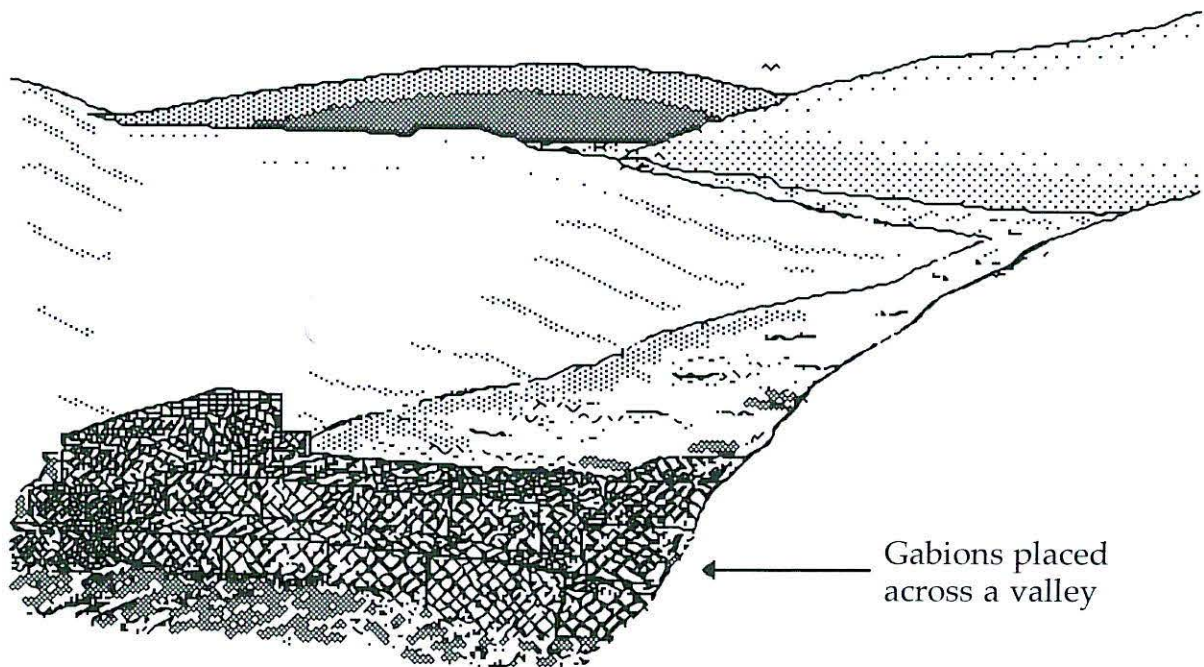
Gabions are filled with rock and placed across small valleys to act as barrages to retard runoff. Runoff water collected behind the barrage seeps into the ground. Resulting high soil moisture allows farmers to plant crops behind the barrage after rainy season.
